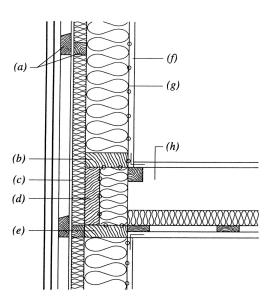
Exterior wall and wall-floor connection with high thermal insulation performance, Träinformation (1992). (a) Horizontal batten, (b) bottom plate, (c) breather membrane, (d) rim joist, (e) top plate, (f) internal sheathing, (g) vapour barrier, (h) floor joist.
